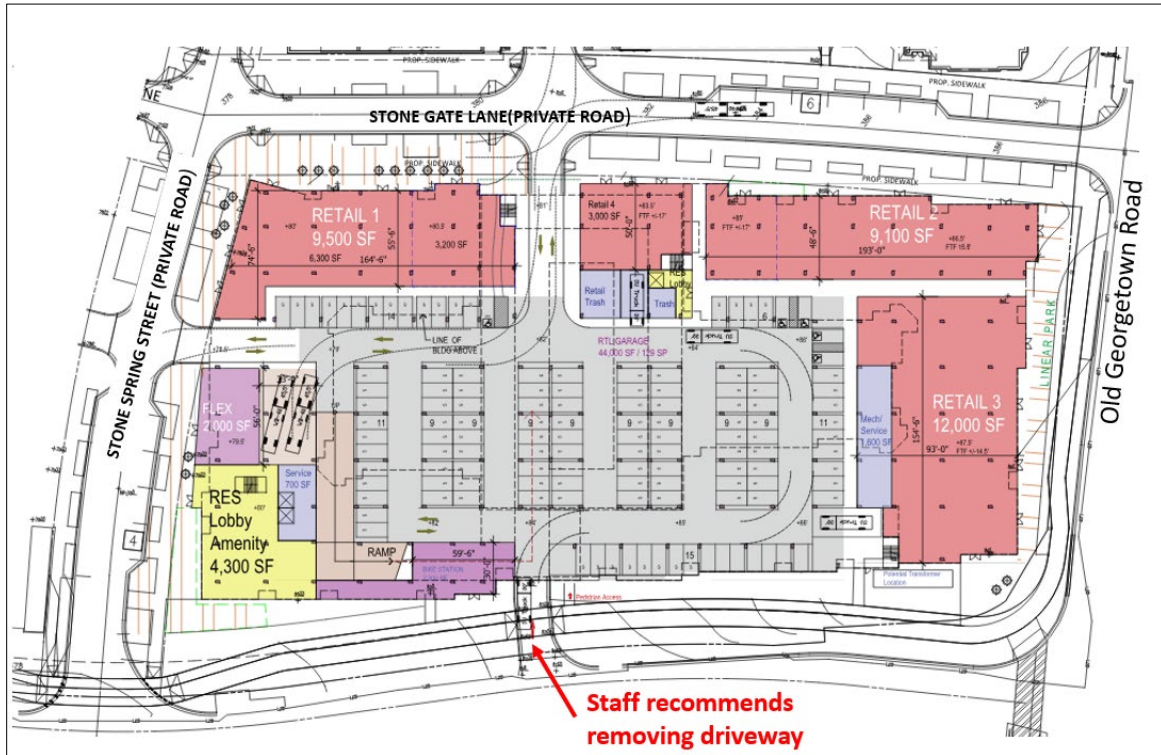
Parcel Q Mixed-Use Building, Ground Floor
